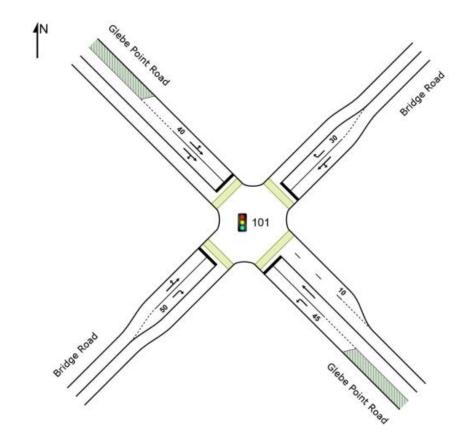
Existing layout of the Bridge Road and Glebe Point Road intersection
